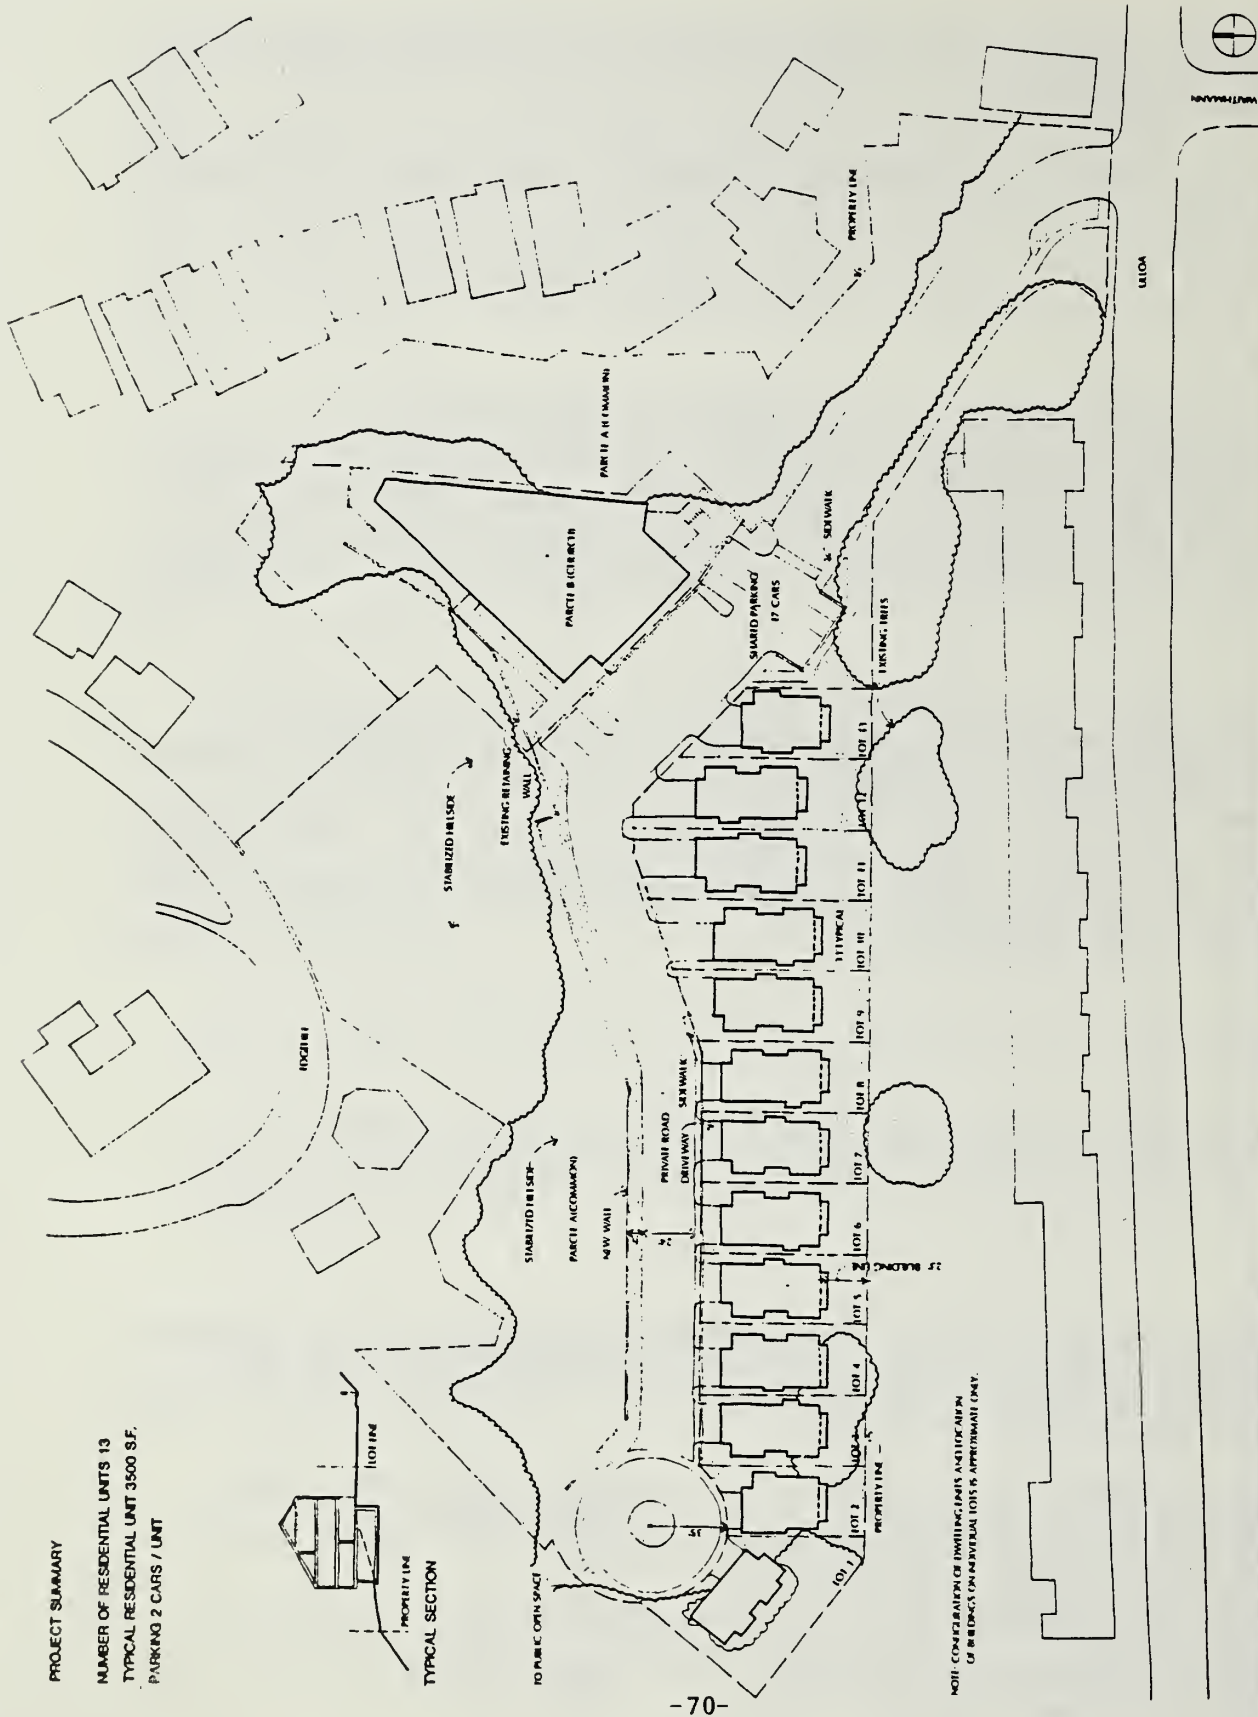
SITE PLAN -- ALTERNATIVE D - 1
